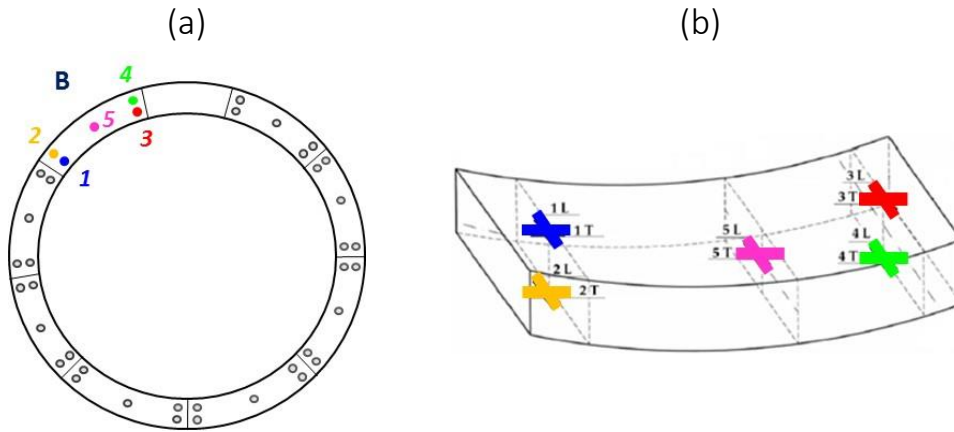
Schematic layout of the vibrating wire gauges positioning in the (a) transversal section and (b) in the plan of the segments of the instrumented ring.
